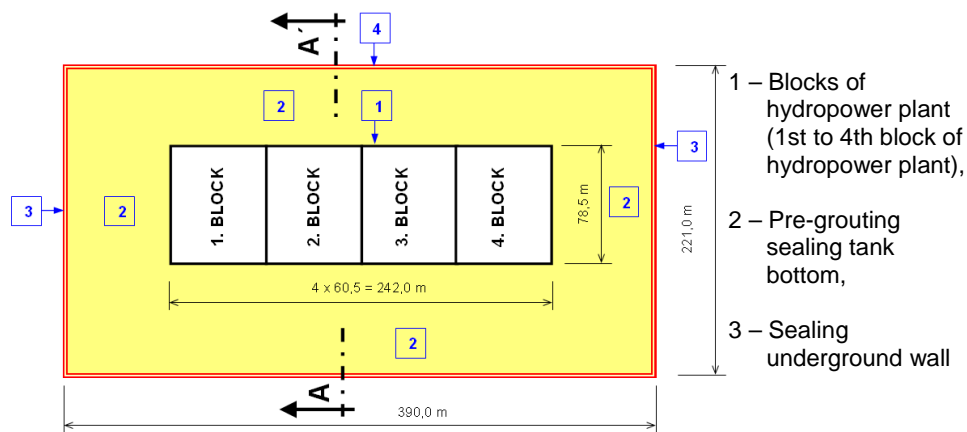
Basic geometric parameters of computational model (sealing tank and hydropower plant) – Plan View.
